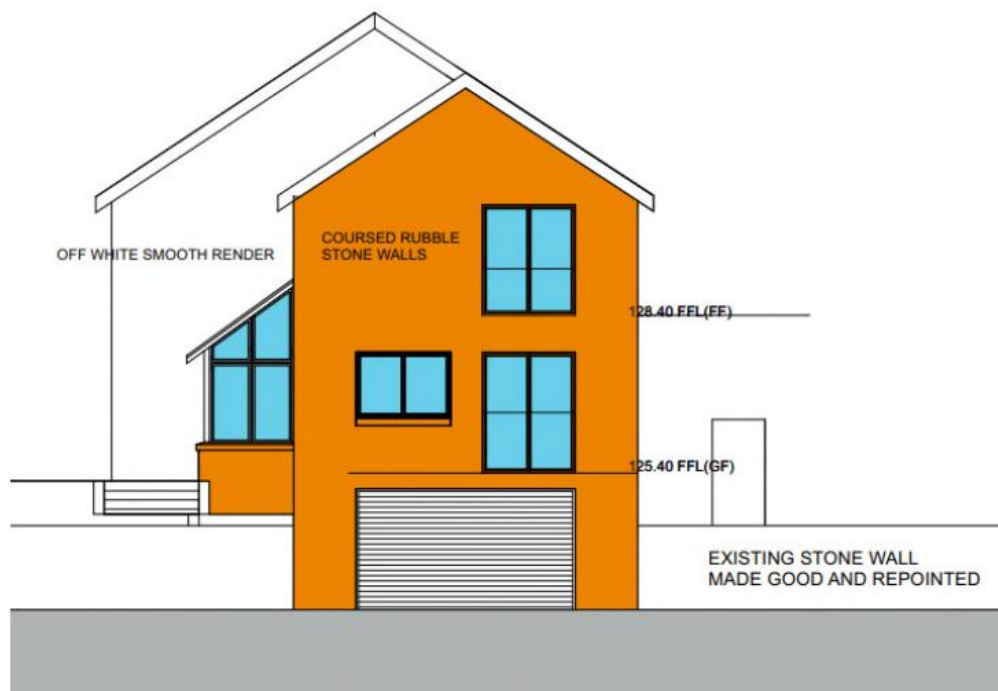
Approved Front Elevation of 3 storey dwellinghouse from Main Street road level adjacent to listed buildings from public elevation
